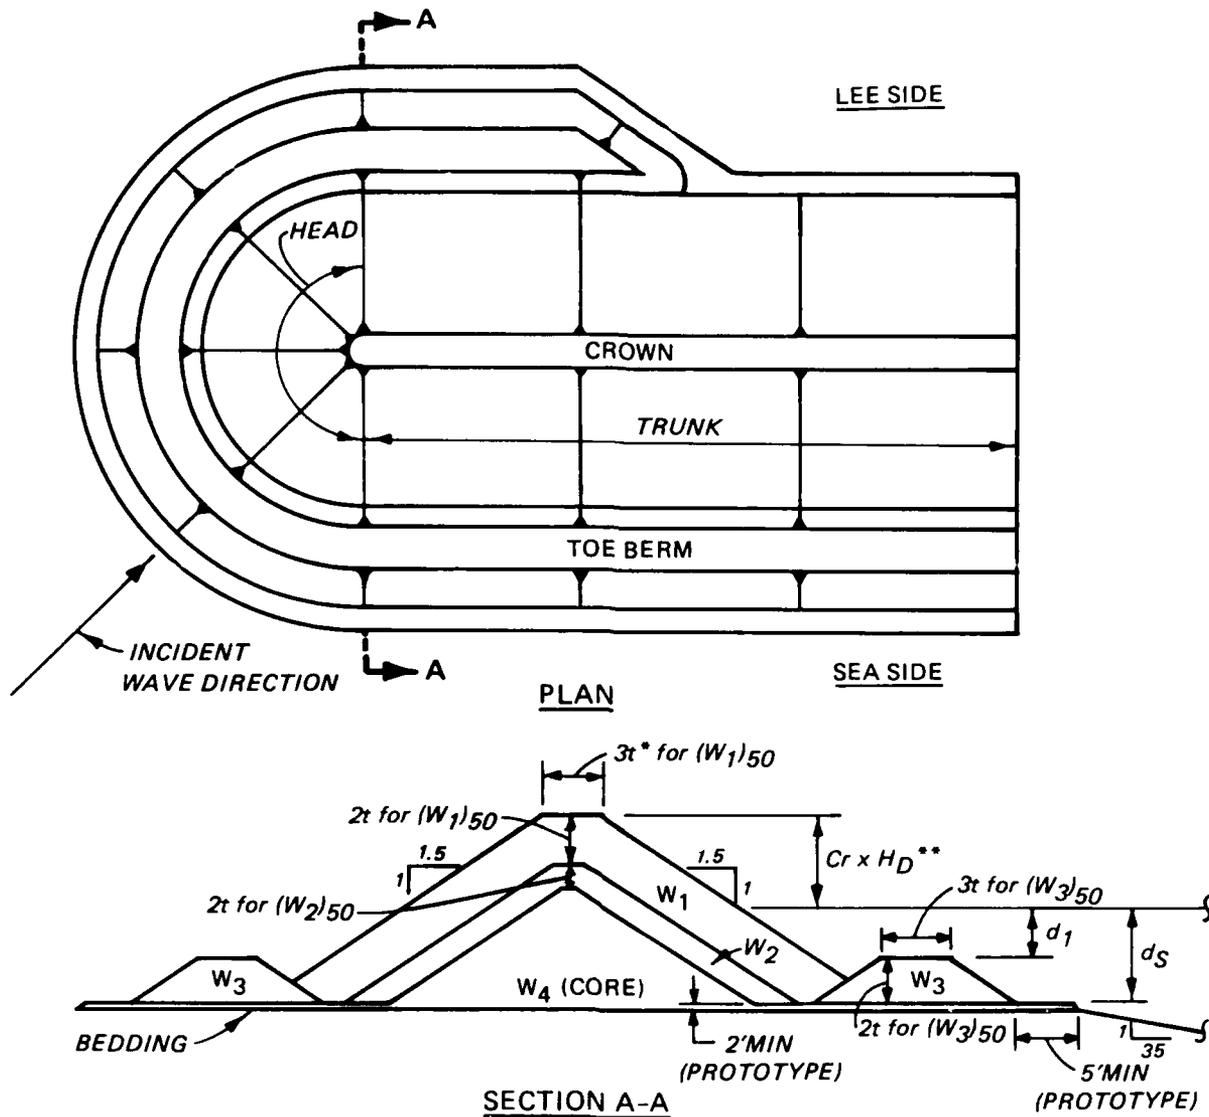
Details of 3-D toe berm stone test sections exposed to 90-deg wave attack
